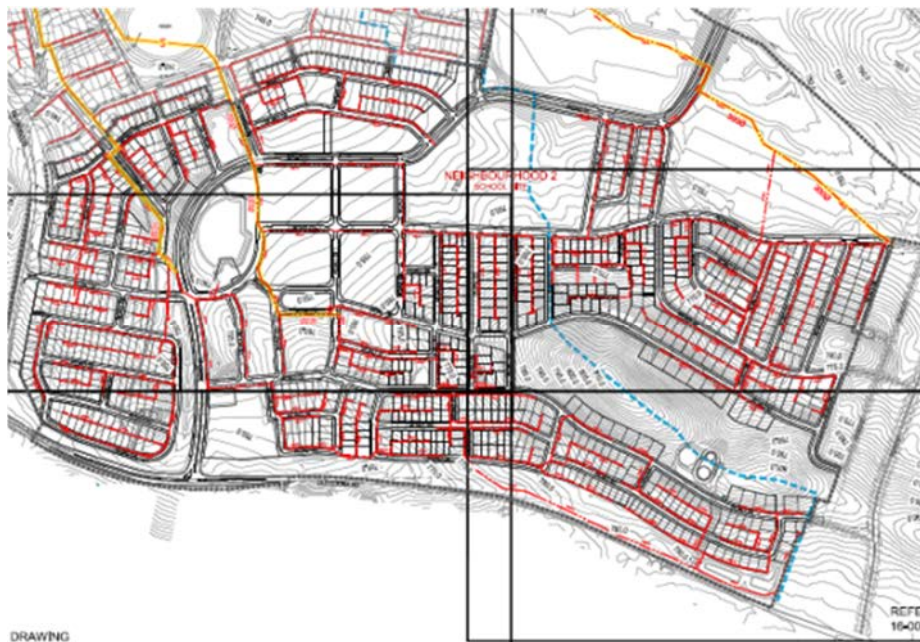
Sewer distribution and reticulation layout to Neighbourhood 2
